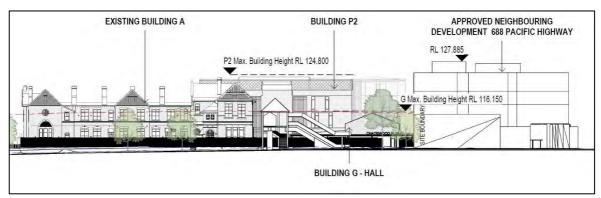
| CPS proposed east (Pacific Highway) elevation (Source: RtS 2020)
